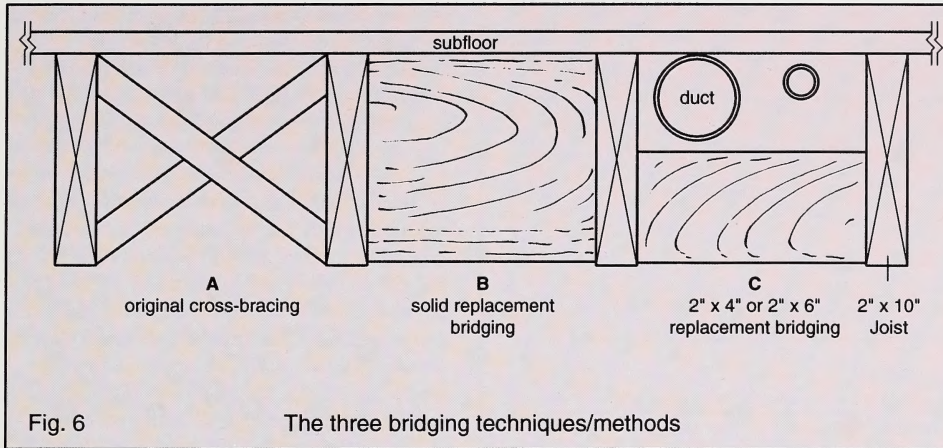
Three bridging methods: A. original cross-bracing (best) B. solid replacement bridging (good) C. 2" x 4" or 2" x 6" replacement bridging (better than nothing). Cross-bracing is very difficult to install once the subfloor is in place. If you have to remove cross-bracing in order to carry out repairs to the subfloor, then the bridging methods illustrated in B and C should be used to serve the same purpose.
